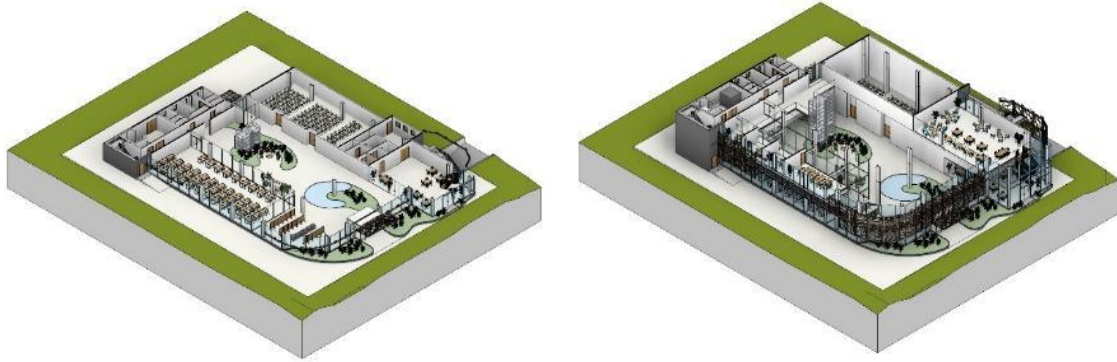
Building layout 3D view - Ground floor and Mezzanine
